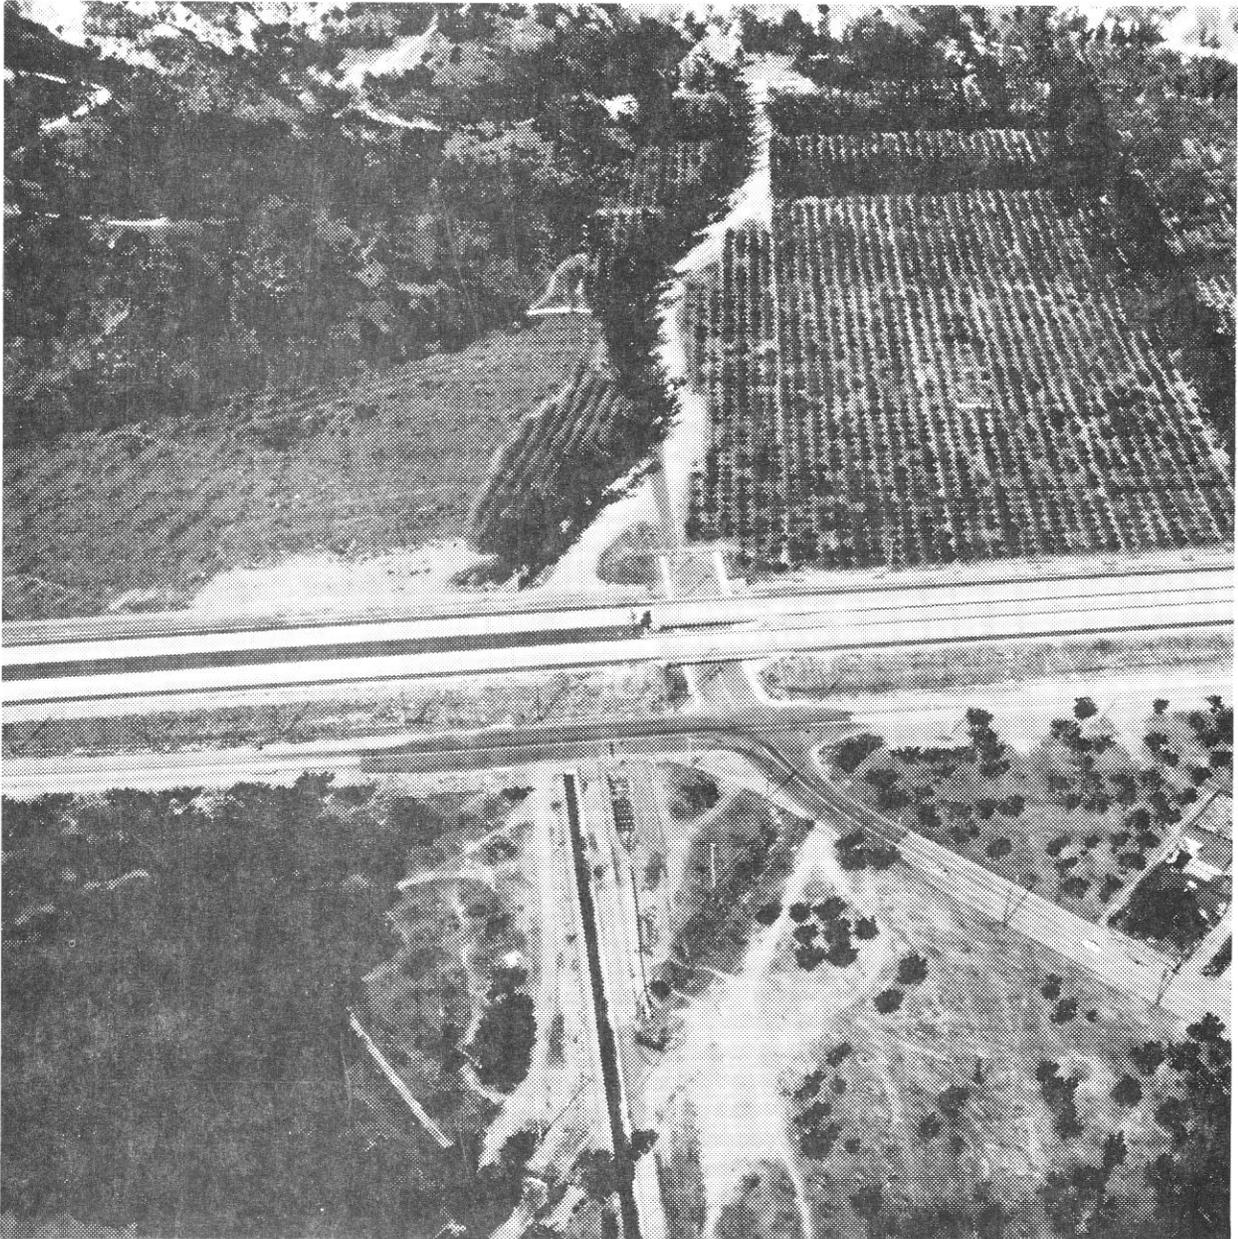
Looking northerly at the Glenoaks Boulevard Undercrossing.
